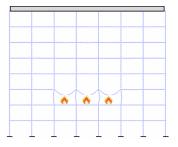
Failure mode of the frame with hat bracing under central multi-compartment fire on the second floor
